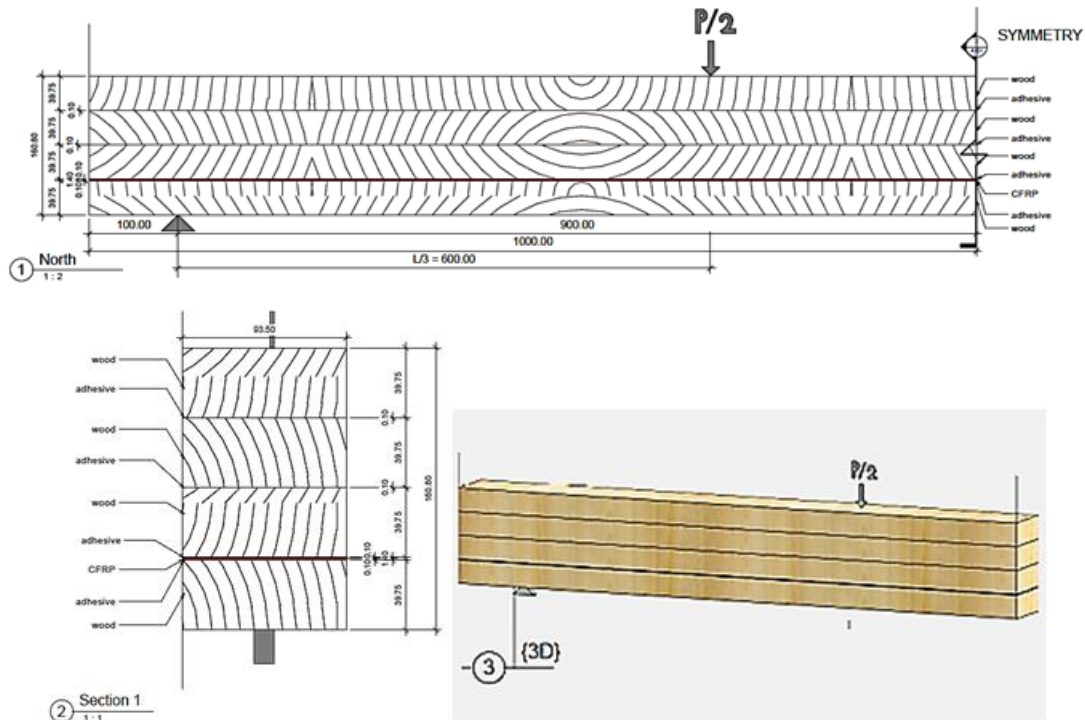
Model II beam – beam cross-section and dimensions [21]
